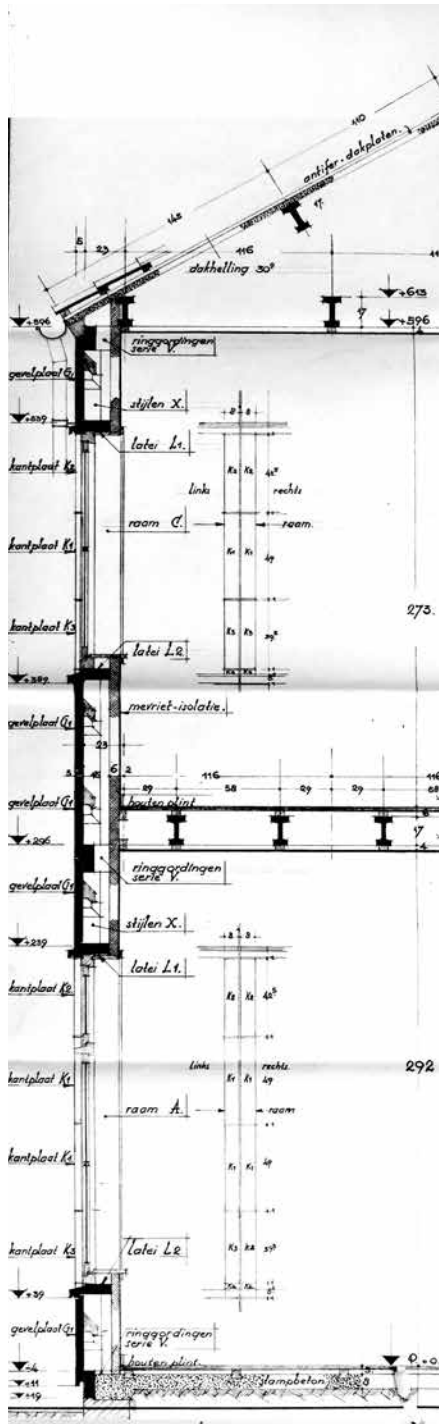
Section through the façade of the pre-fabricated Dotremont-Ten Bosch row-housing design. Note the prefabricated I-beams carrying both wall and roof (NA: 10807-10810)
